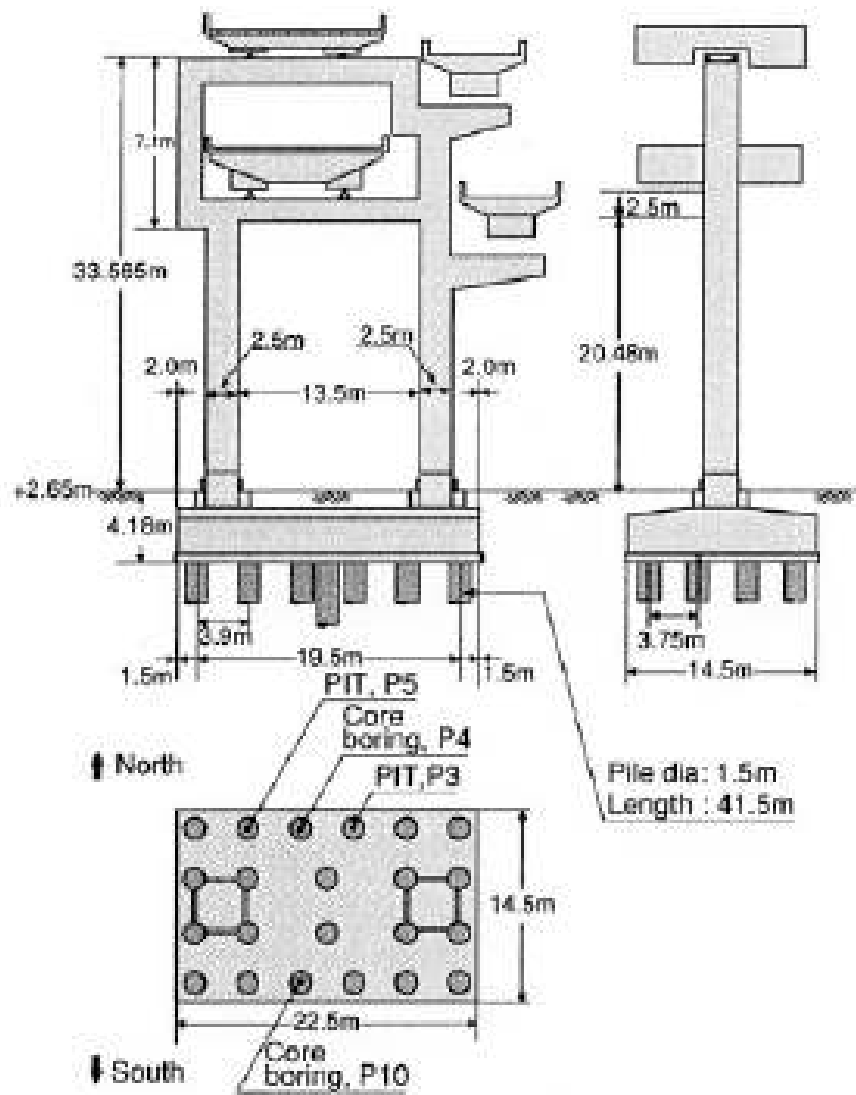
Uozakihama Bridge Structure and Foundation Configuration (Ishihara, 2003)
